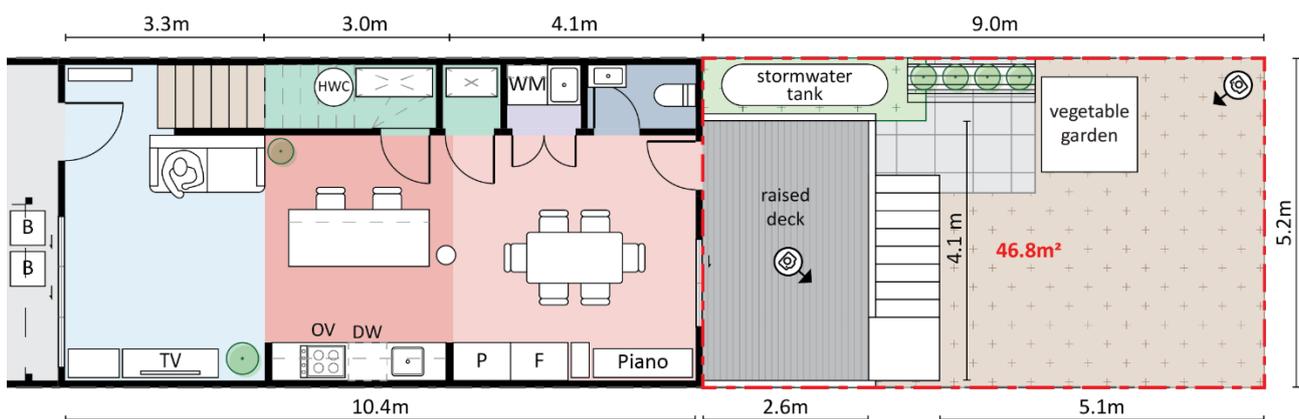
Outdoor living space with a deck and steps leading down to steeply sloping barked area
